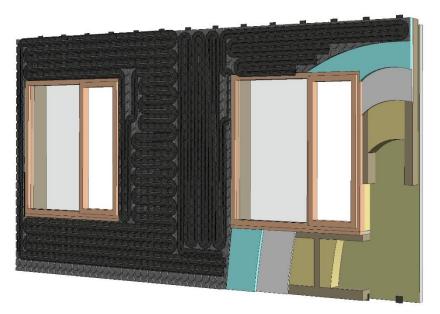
LAYERS OF THE CONEXWALL INTERIOR PANEL
